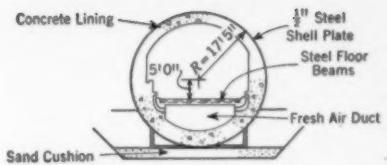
Concrete for circular cross section of Baytown Tunnel is cast entirely within  $\frac{1}{2}$ -in. steel tube.
